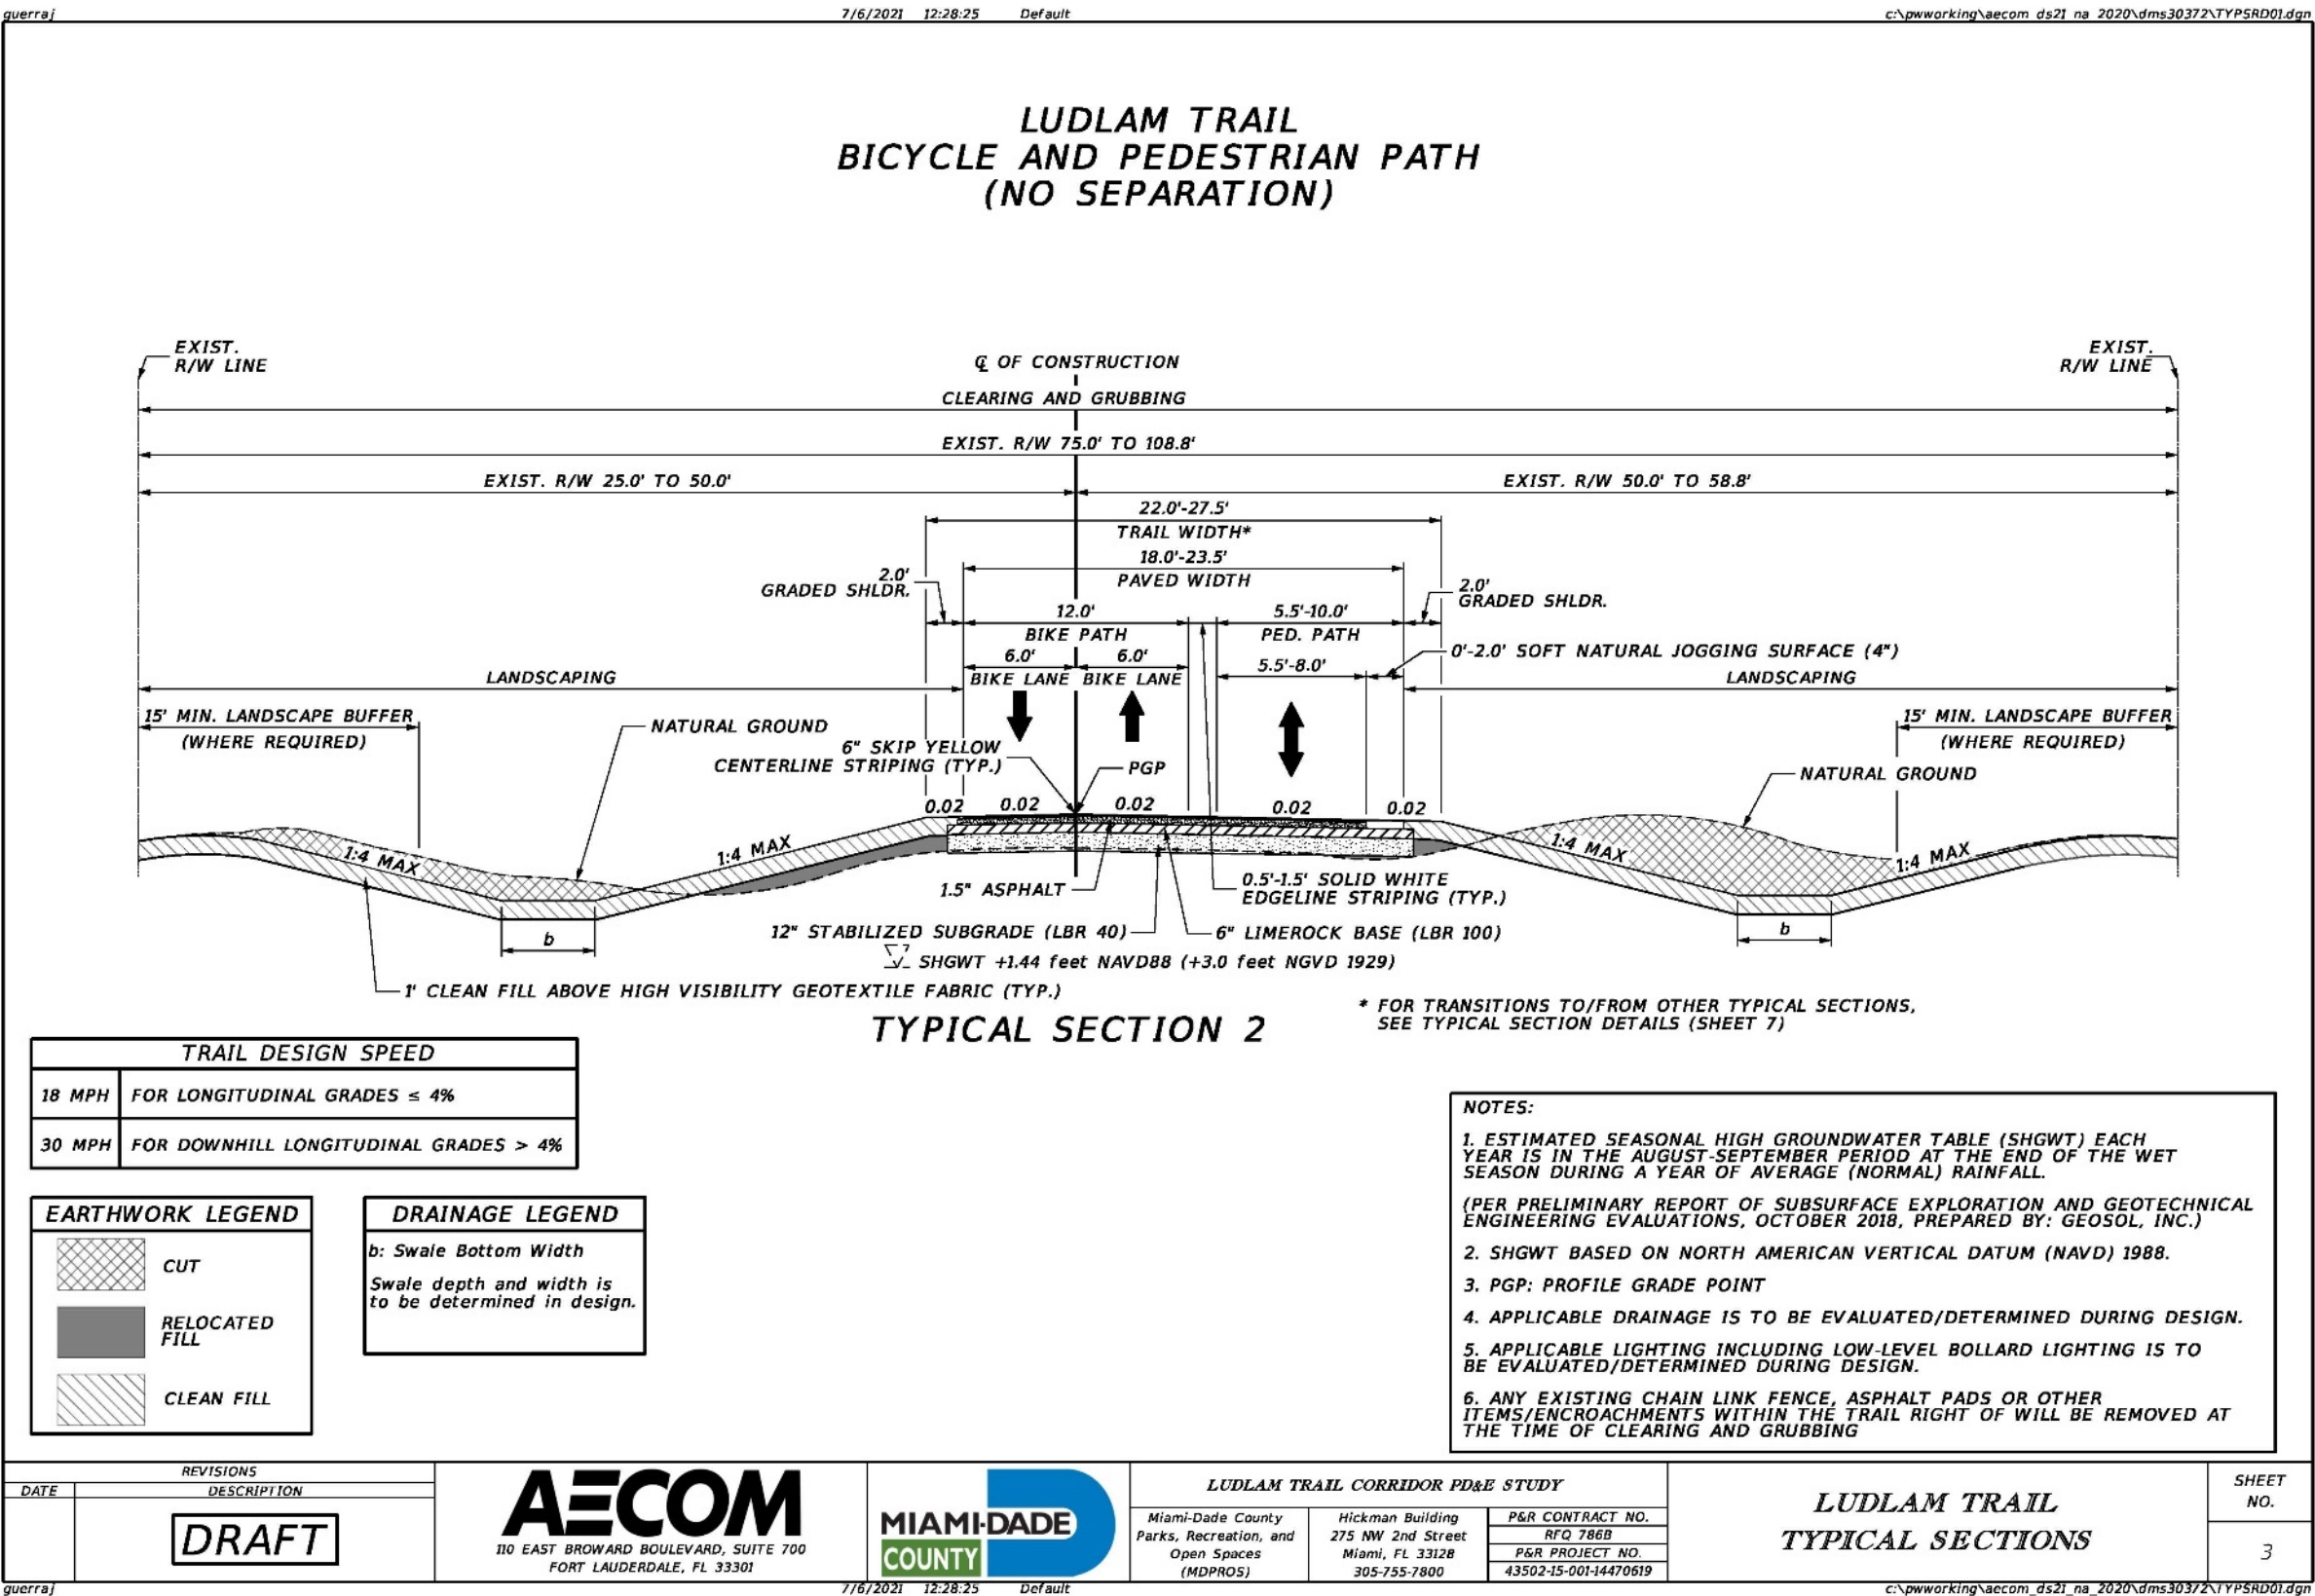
Proposed Typical Cross Section for Ludlam Trail (No Separation)
